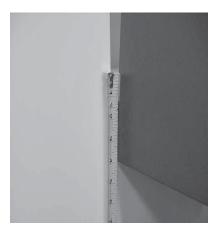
Measure from bottom of wall opening to bottom of sleeve.
